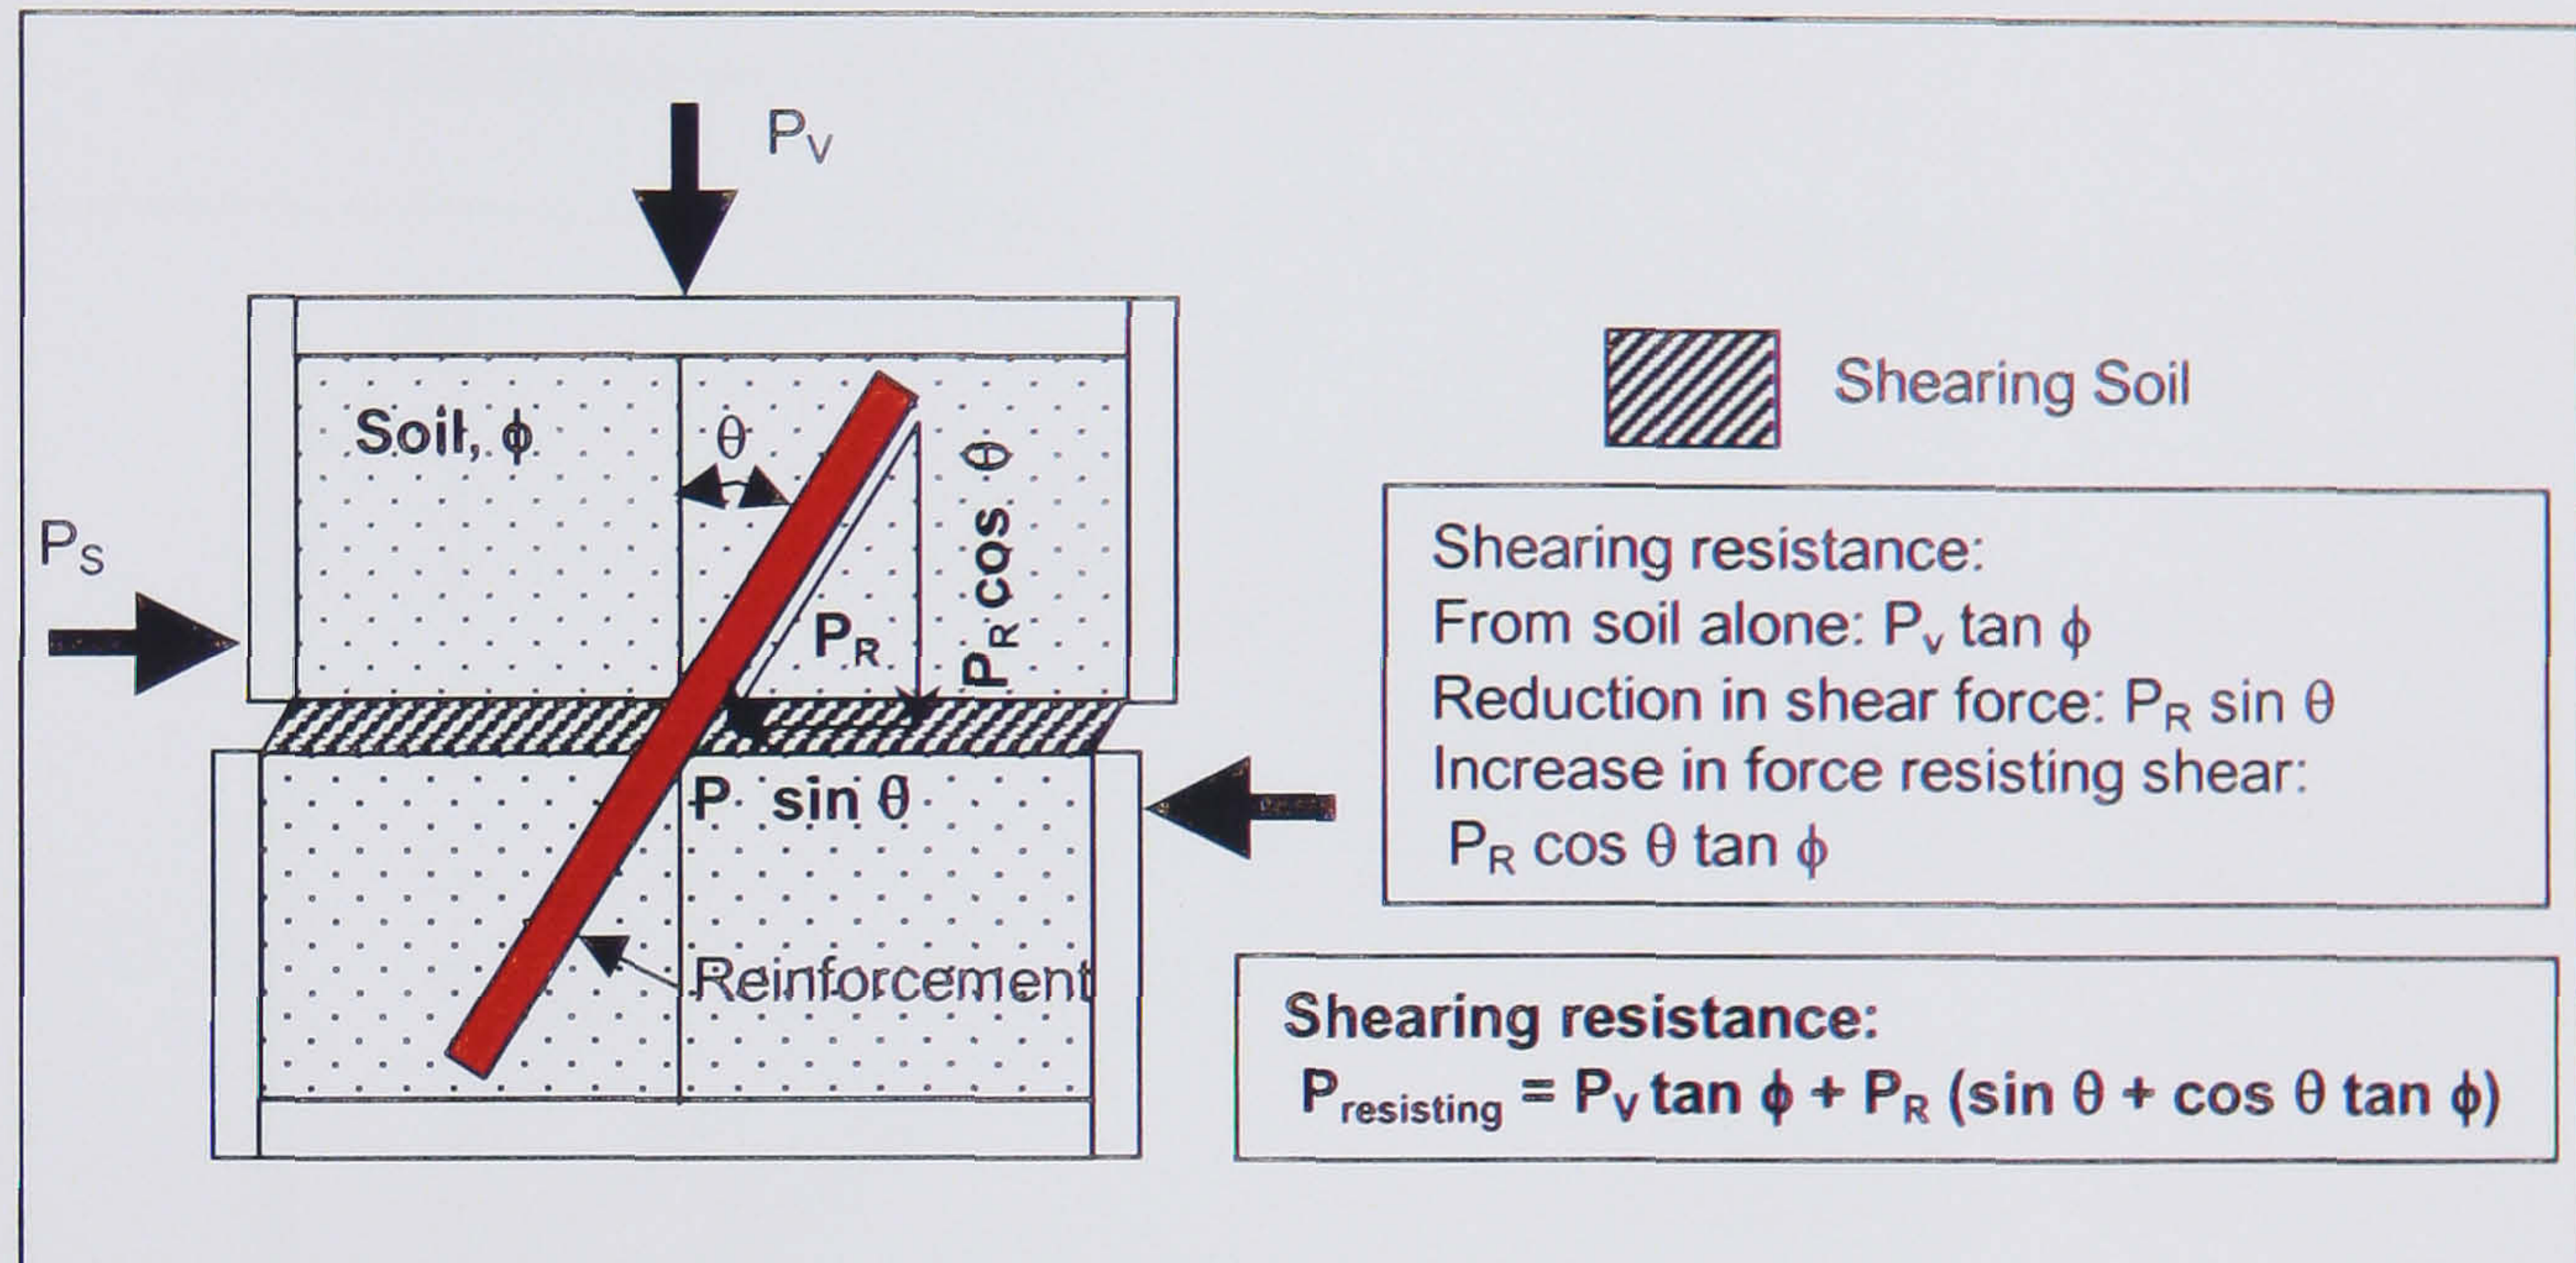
Idealised failure element in reinforced slope (After Jewell & Wroth 1987)
